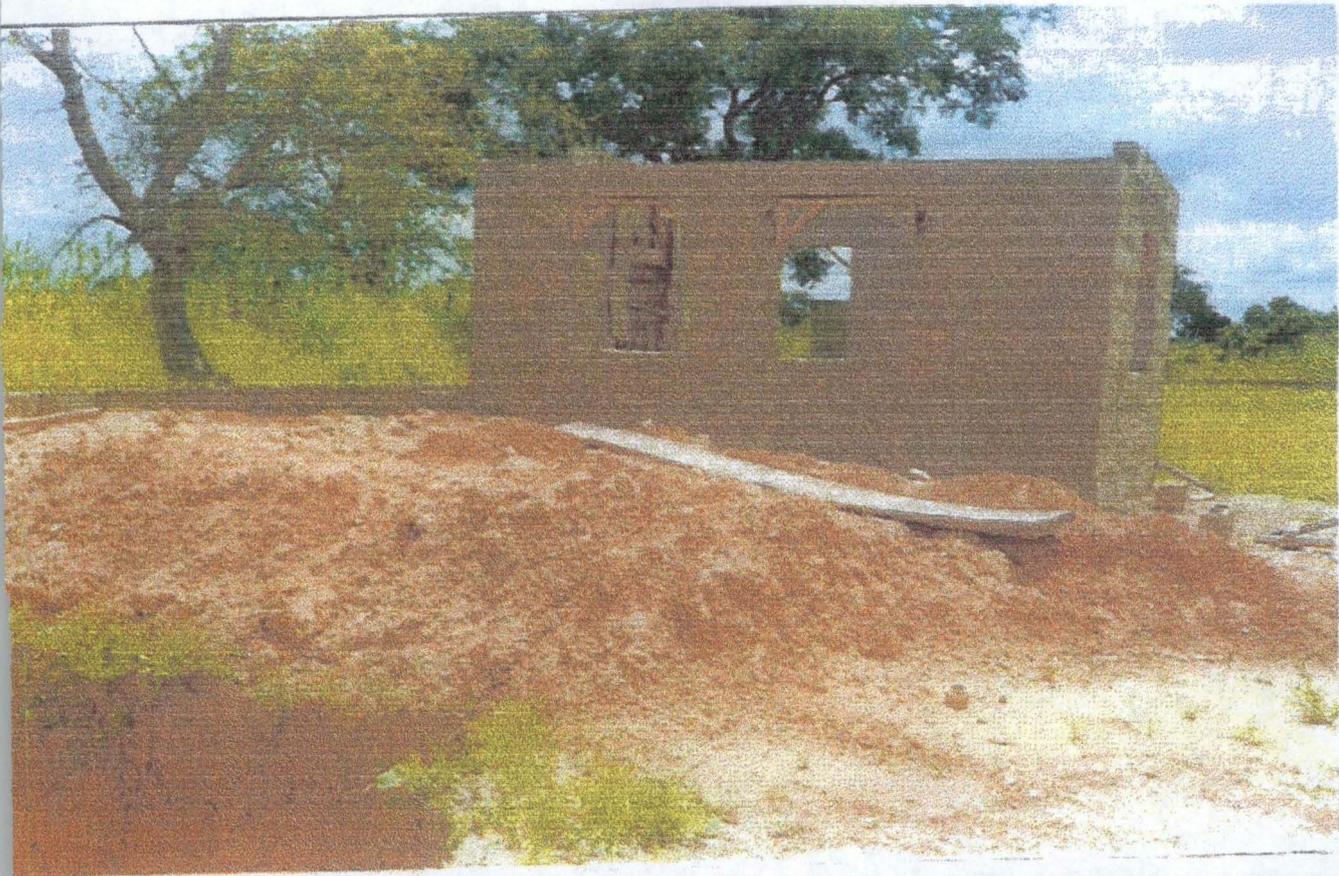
Influx of people into the town involved in deforestation, an example of the above picture shows construction or building of a house.
